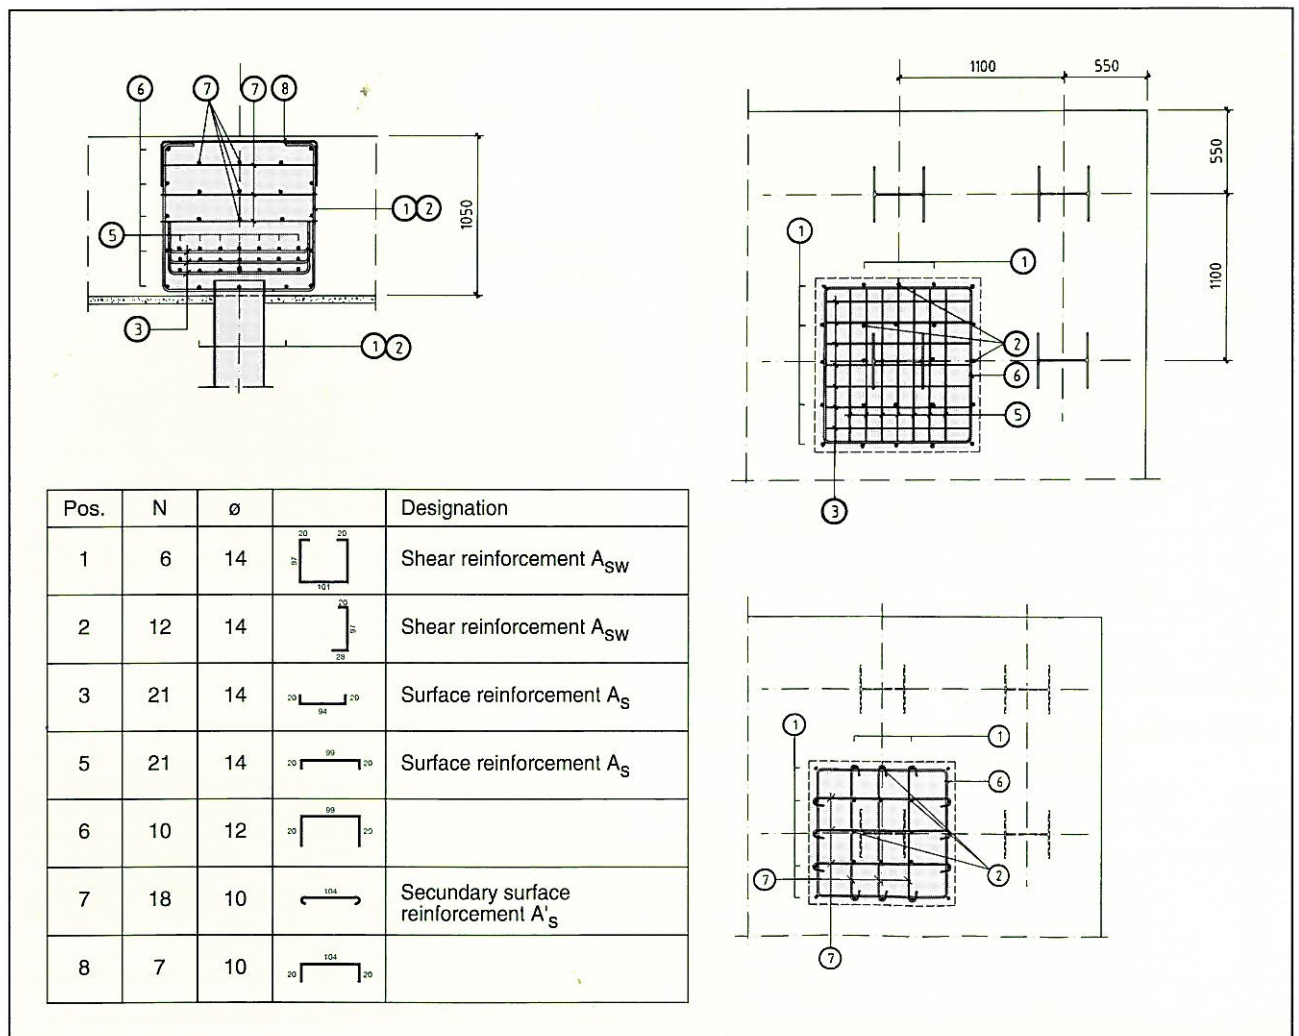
Example of reinforcement for the connection of an HP 360x84.3 pile in Fe510
